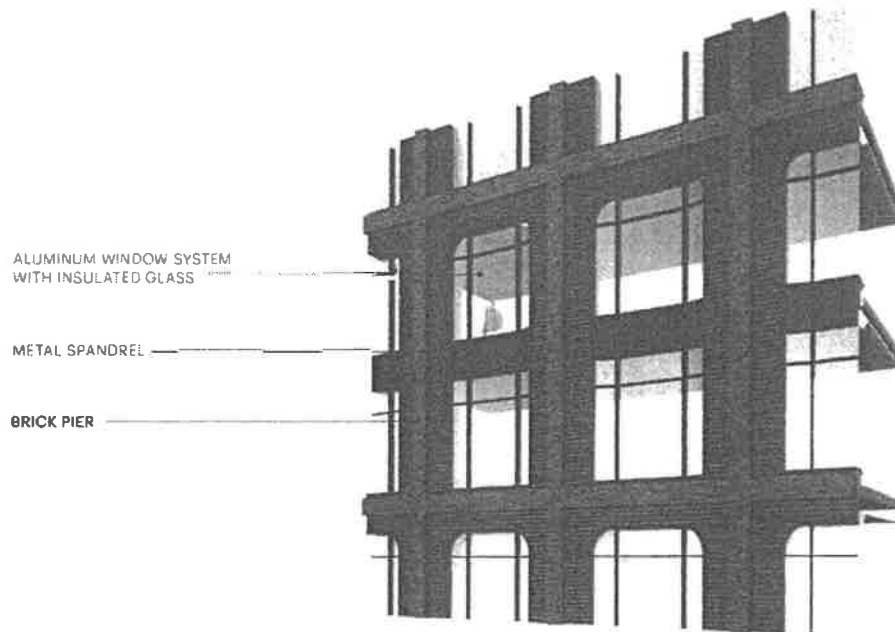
C : FACADE AXON DETAILS (UPPER LEVELS)
